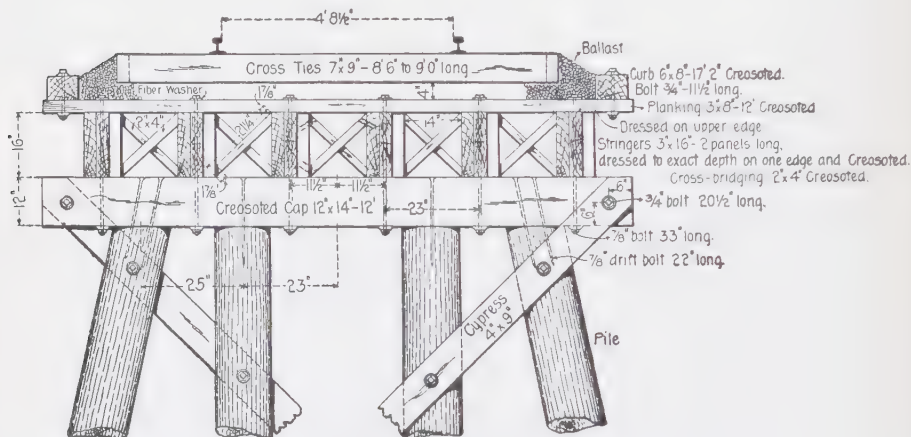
Cross-section of Pile Trestle with Ballast Floor.
